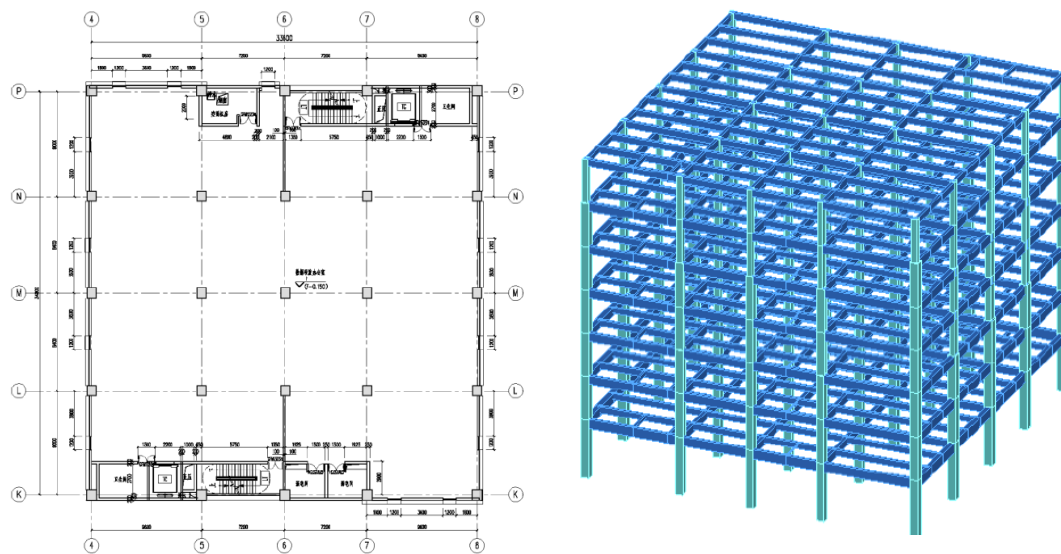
Chinese 7-story reinforced concrete frame (8-degree)
